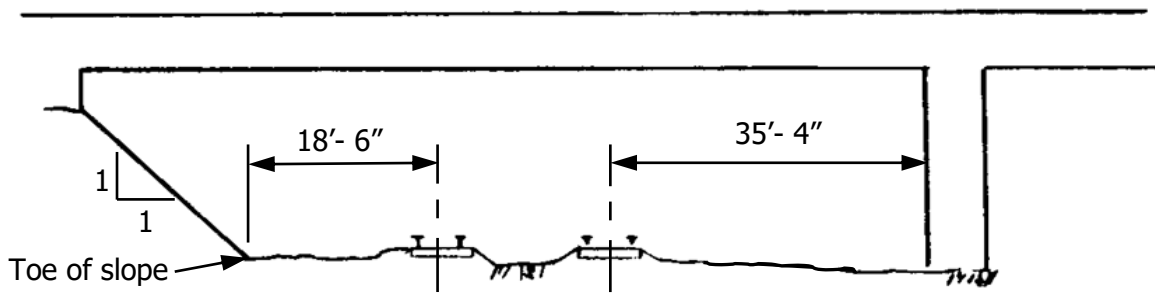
Bridge elevation view indicating horizontal offset for two railroad tracks below the bridge.
